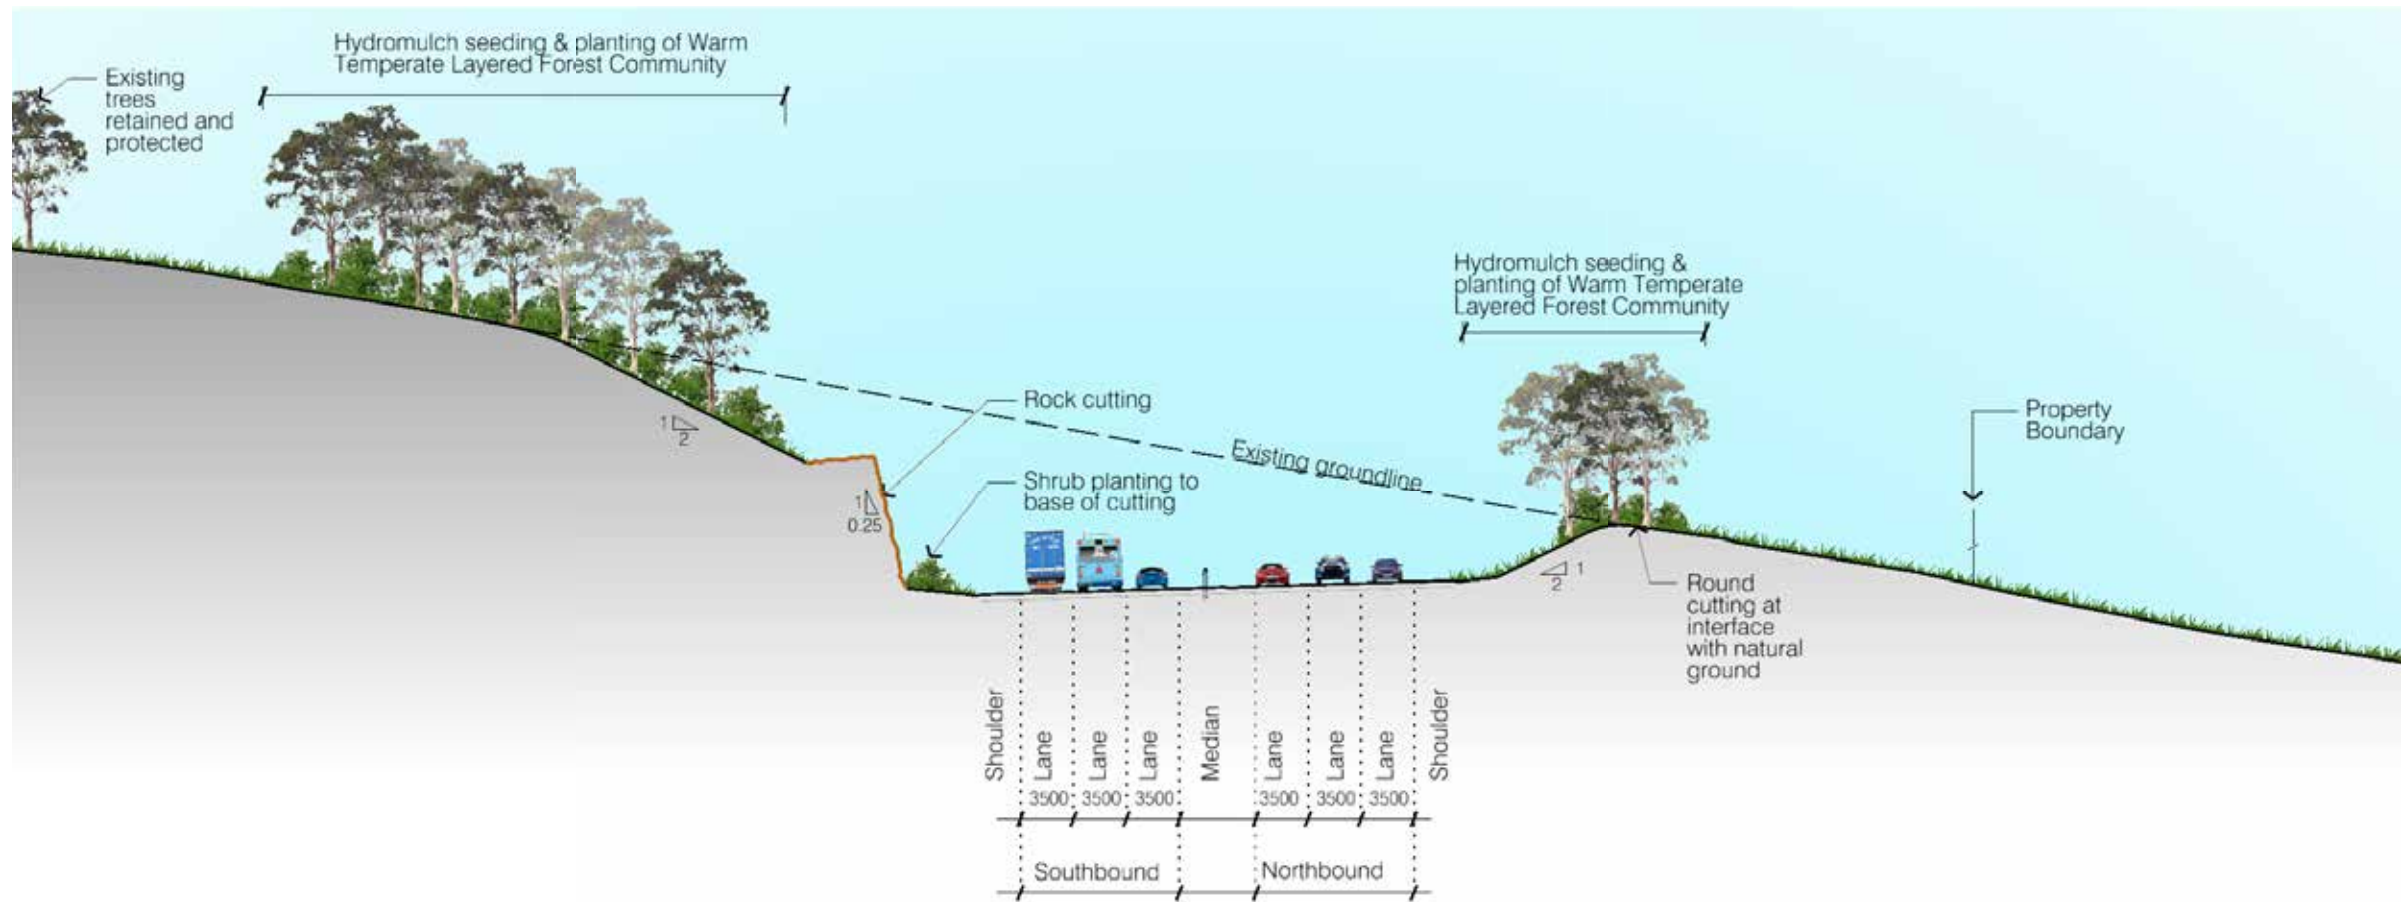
Road cross section at Ch. 9200 (Scale 1:500 @ A3)
